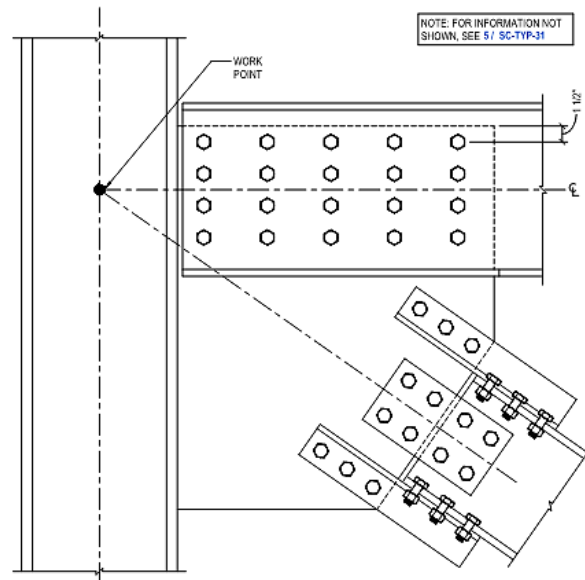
Vertical Brace Connection: Gusset Shop-Welded to Beam
